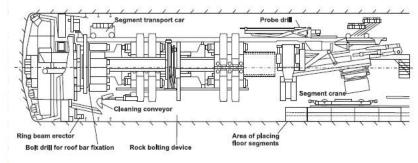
54. Scheme Double-gripper TBM.
